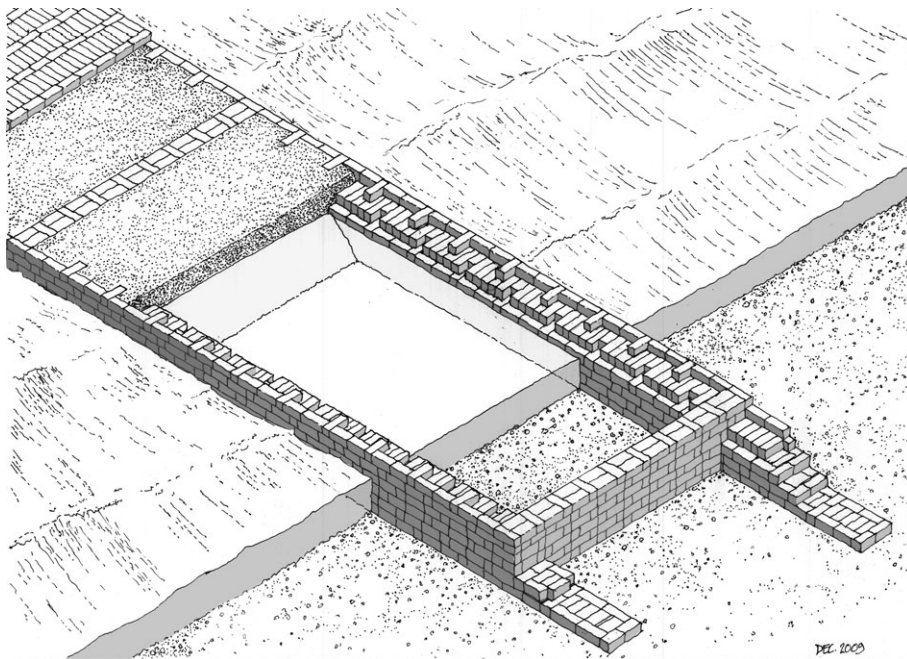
Reconstruction sketch of concrete laid in ashlar permanent formwork. (C. Brandon)
